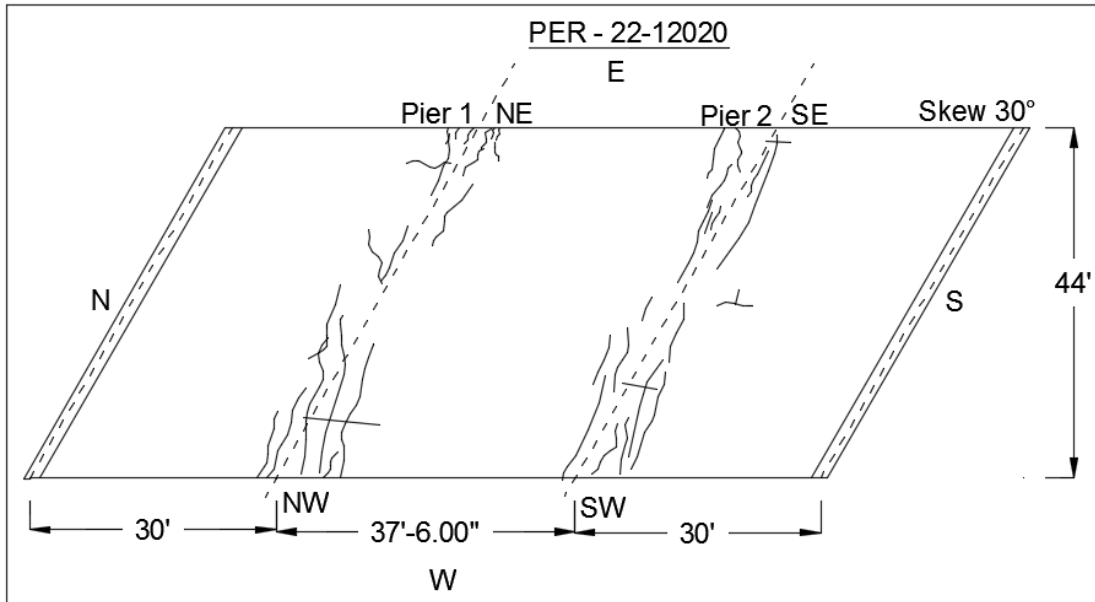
Bridge Inspection Pictures and Crack Map – PER-22-12020
